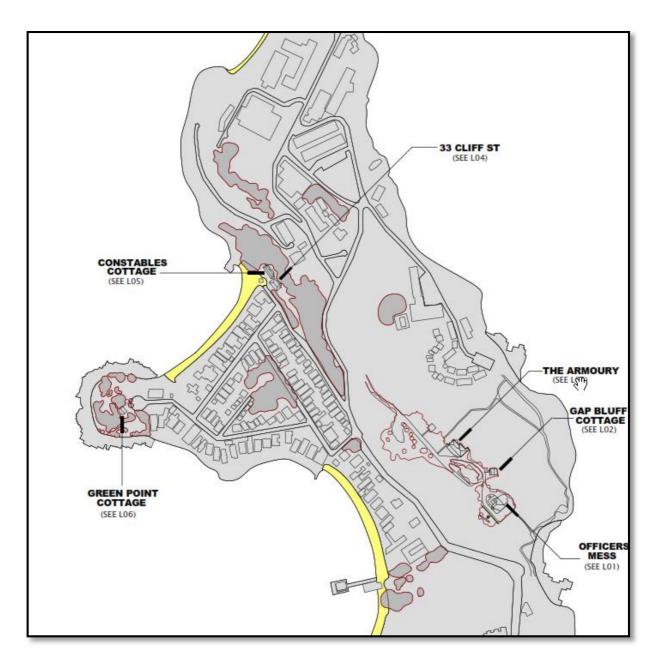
Location Plan (Source: Drawing L00, Detail Landscape Concept Plans, Gap Bluff, March 2015)
